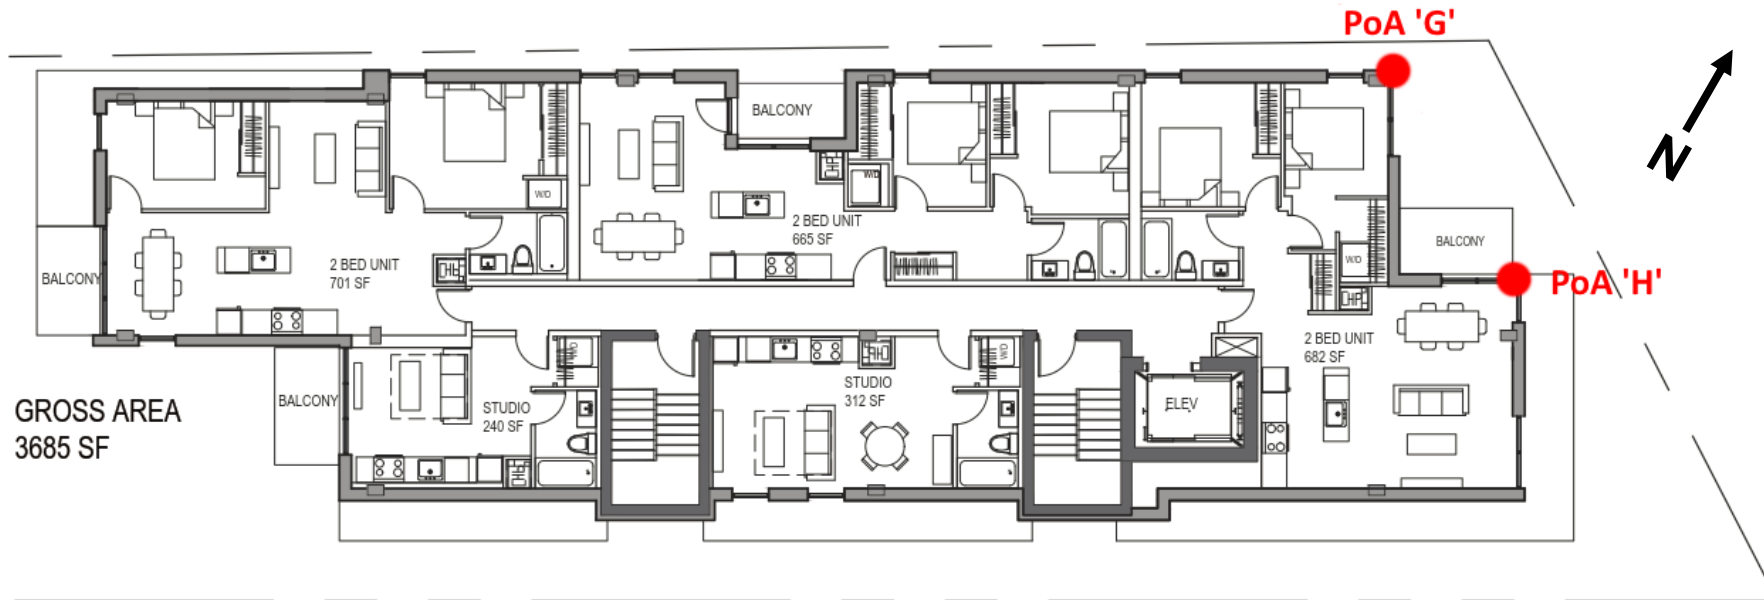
Site plan showing location of Points of Assessment PoA 'G' and 'H' on the sixth level.
